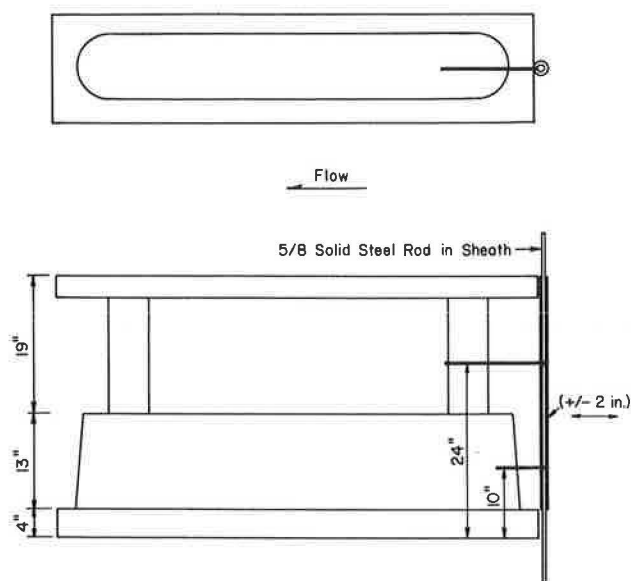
Plan (top) and profile (bottom) of model pier.
